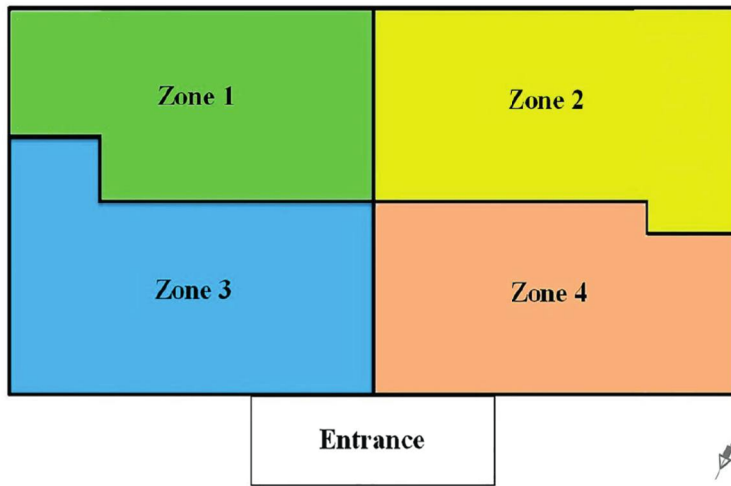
Building plan divided into four zones per floor. The arrow points to the north.
